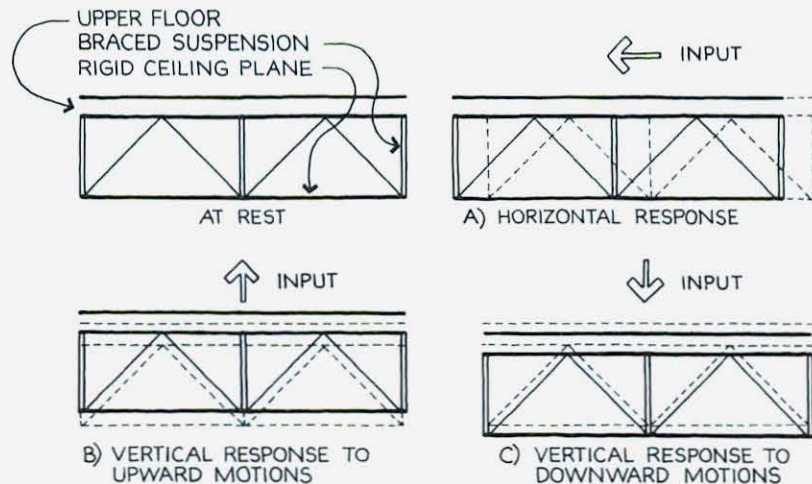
CEILING TYPE: RIGID CEILING PLANE - BRACED SUSPENSION.
